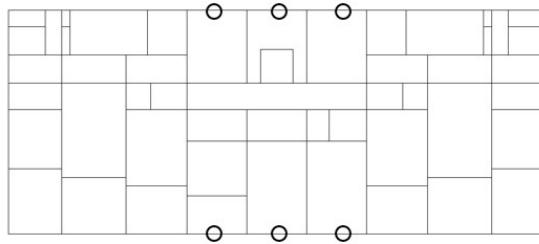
Damper Placement at roof floor (R-X); MSSSA: 6 dampers, ODAM: 0 damper
